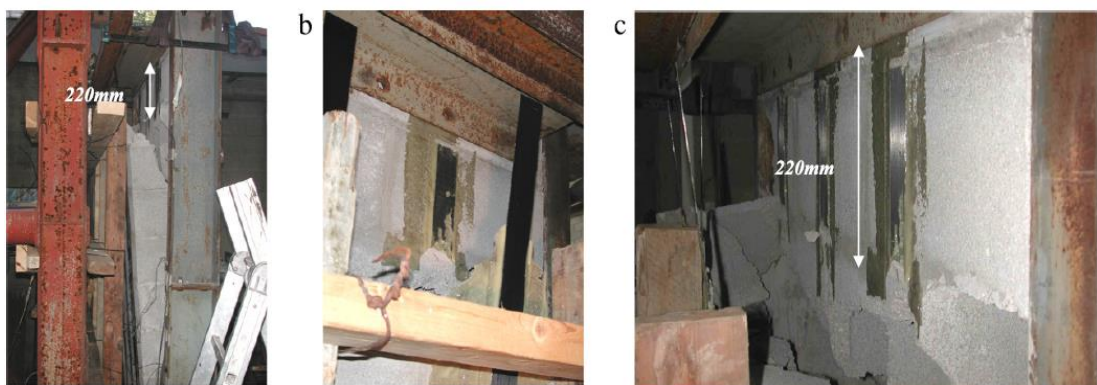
3: Structural functioning of reinforced masonry wall subjected to loading (out-of-plane)
